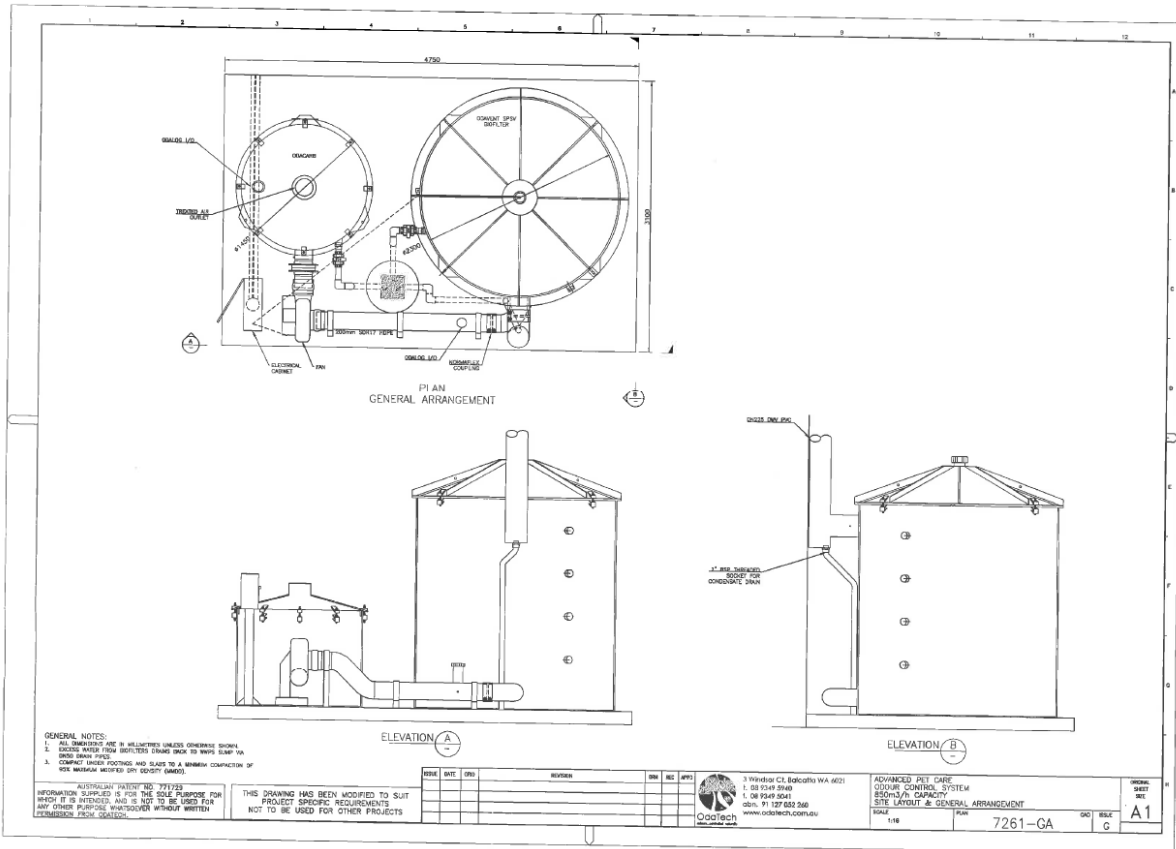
Site Layout of new Odour Control System to be constructed at the Premises
